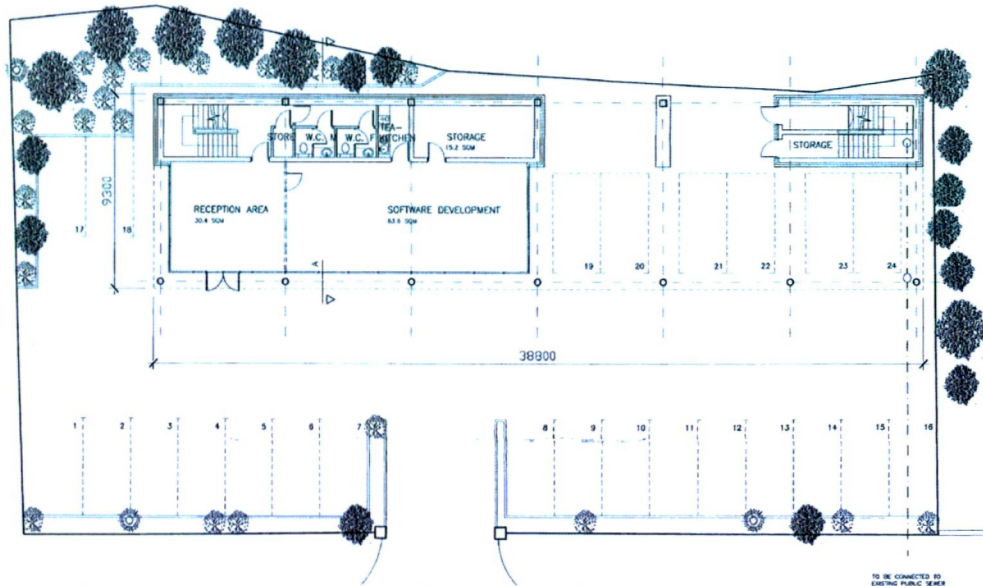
Extract of the Layout Plan of the development under Reg. Ref.: S01A/0235
